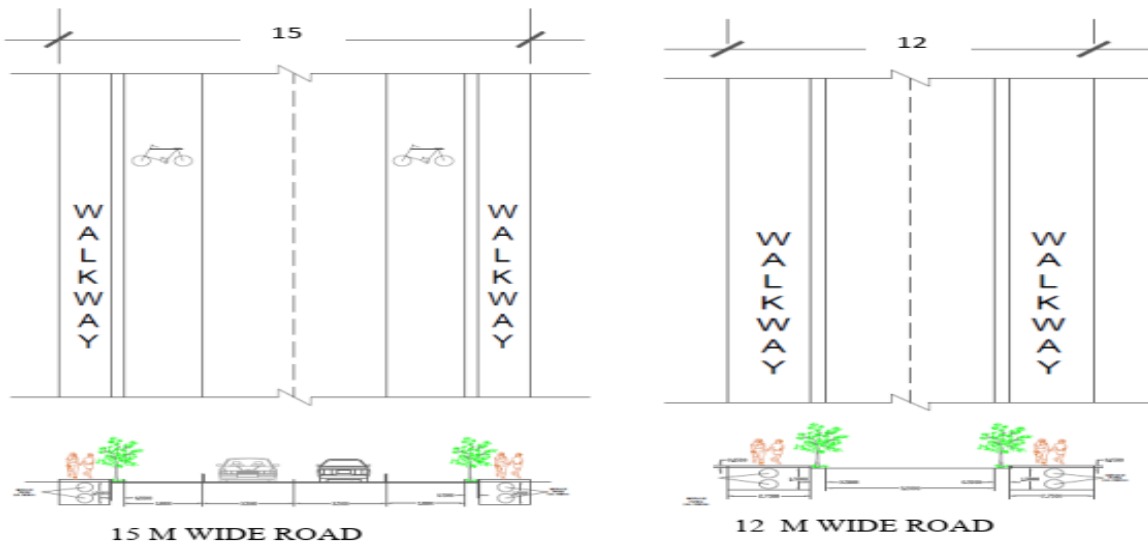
Proposed Road Cross Section (15 m and 12 m)
